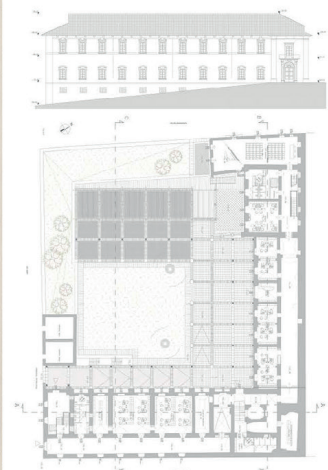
Palazzo Camponeschi in L'Aquila (IT). Historical image of the façade, lower floor and main elevation.
